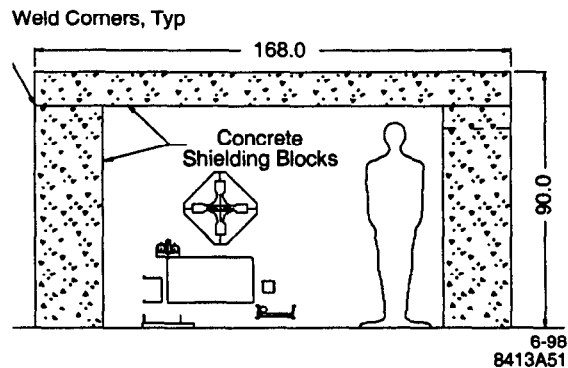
A cross-section of the SPEAR tunnel showing wall and roof shielding blocks.
